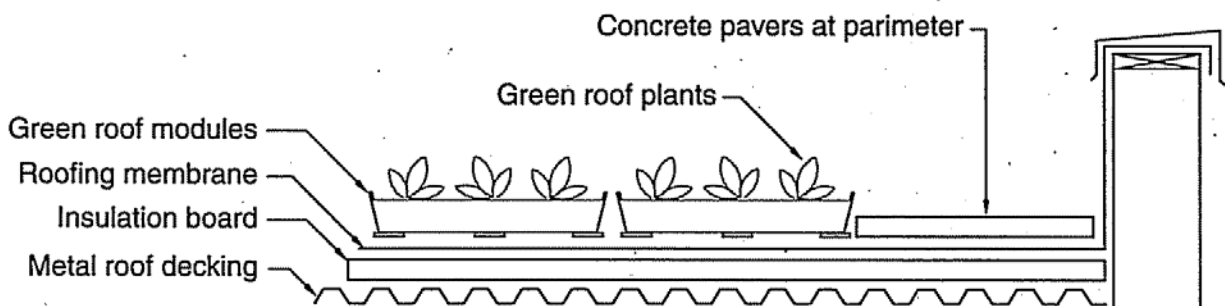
Typical cross section of a modular green roof (source: Luckett 2009)
